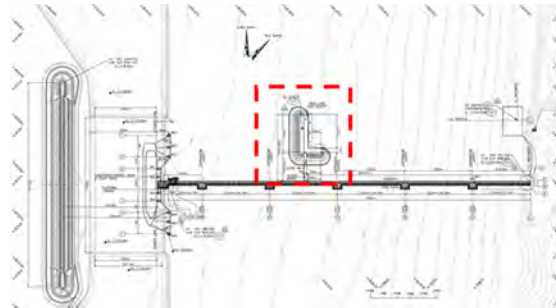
Rock Load Out Facility - RLOF - Melchorita Peru
